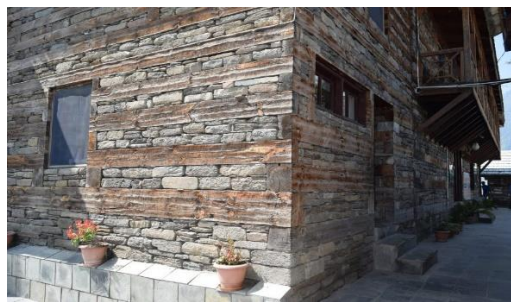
Kath Kuni* of Himachal Pradesh, Wood and stone as wall material.
